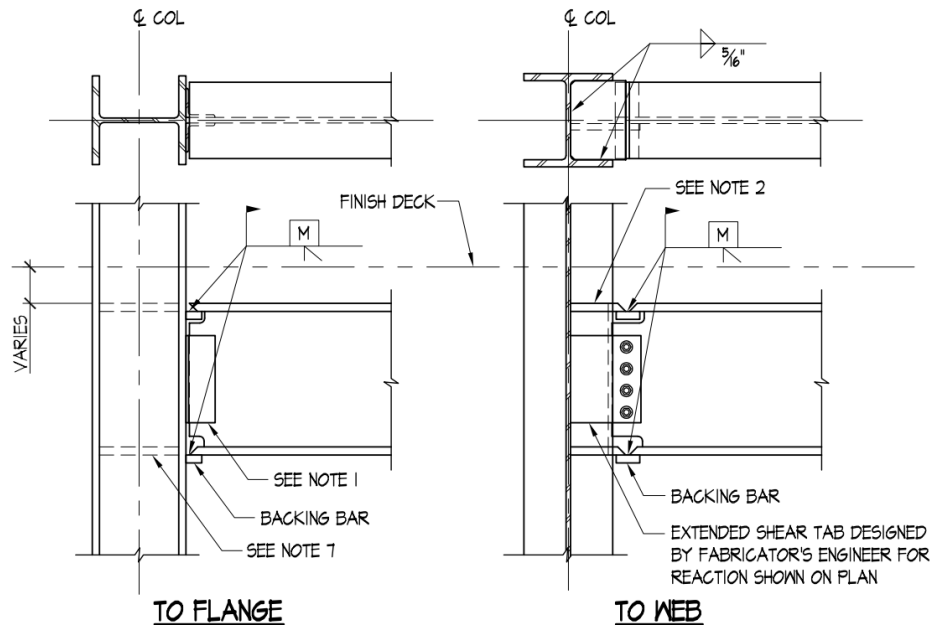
Typical Fully Restrained Moment Connection Detail (Beam to Column), 3/S2.01
